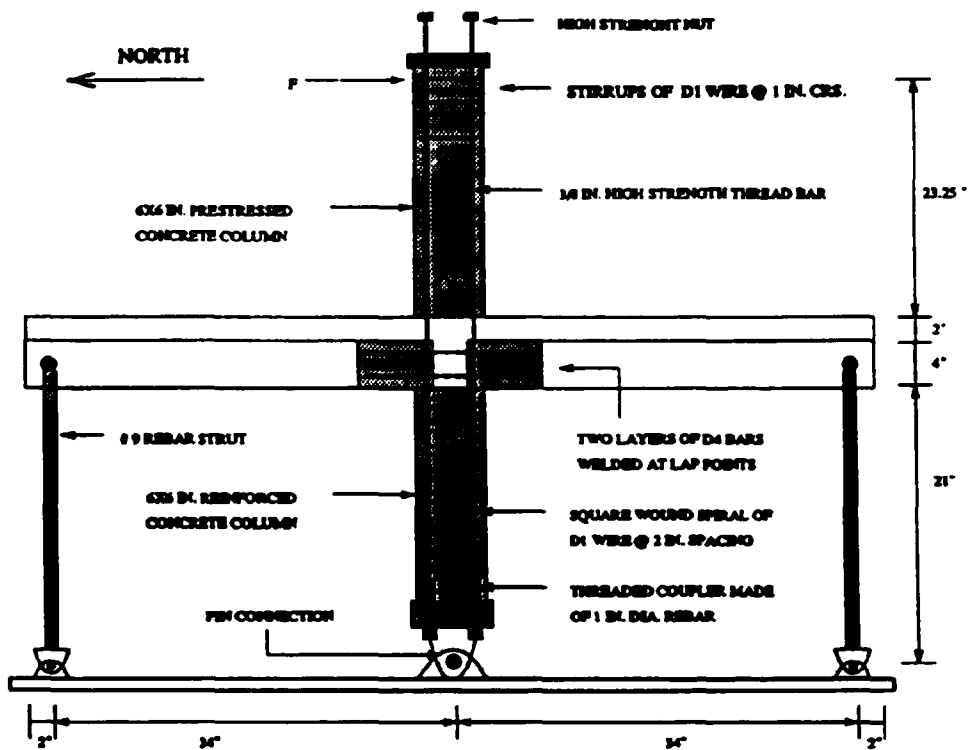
Reinforcement Diagram for the Retrofitted Specimen
